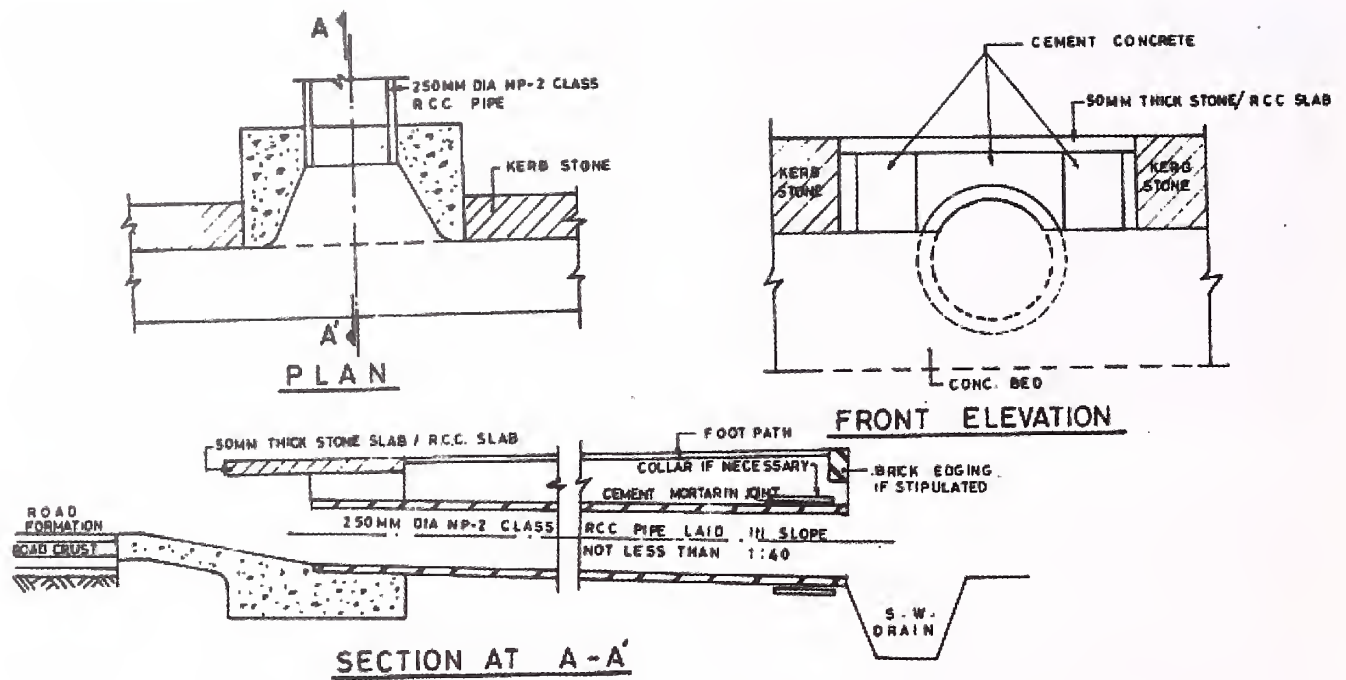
(a) Schematic Arrangement Showing Bell Mouth Drain
